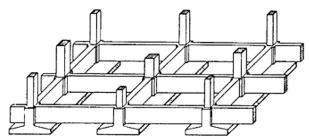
Spread footing in foundation plane (Geotecnia, 2019).
